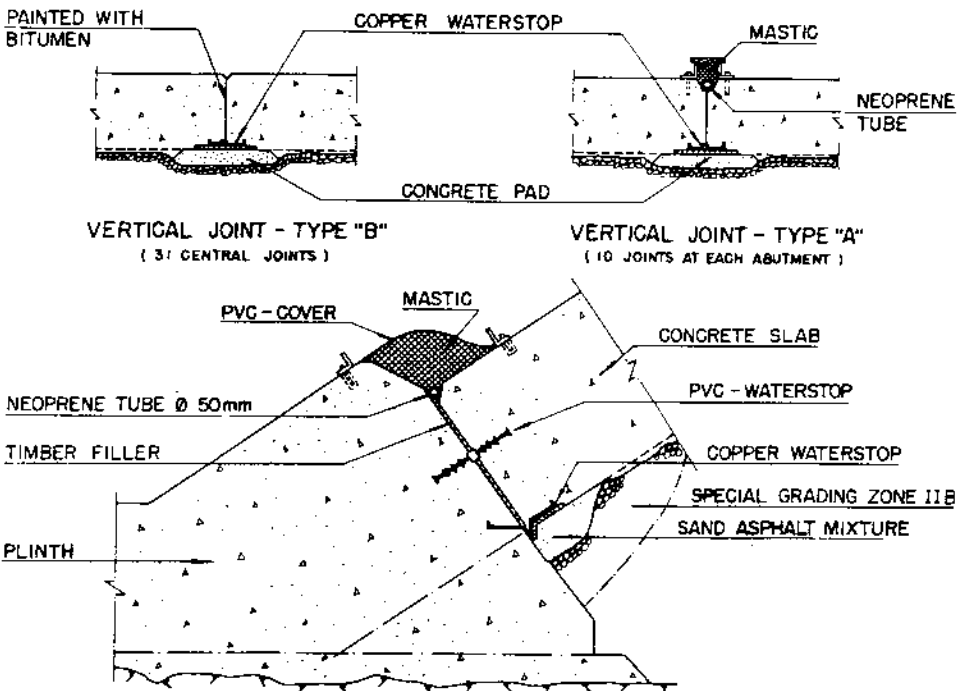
Joint details for Foz do Areia Dam (Pinto et al. 1985).
